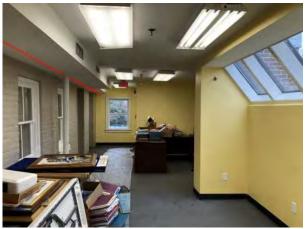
C-7: Second Floor interior, 1980s addition, looking north. Interior beam line highlighted in red.
